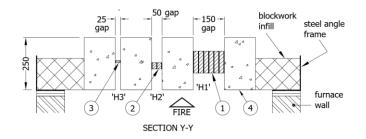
Cross-section of floor linear gap systems B1-B3 – assessment 2 (as shown in WF 148052) – dimensions in mm
